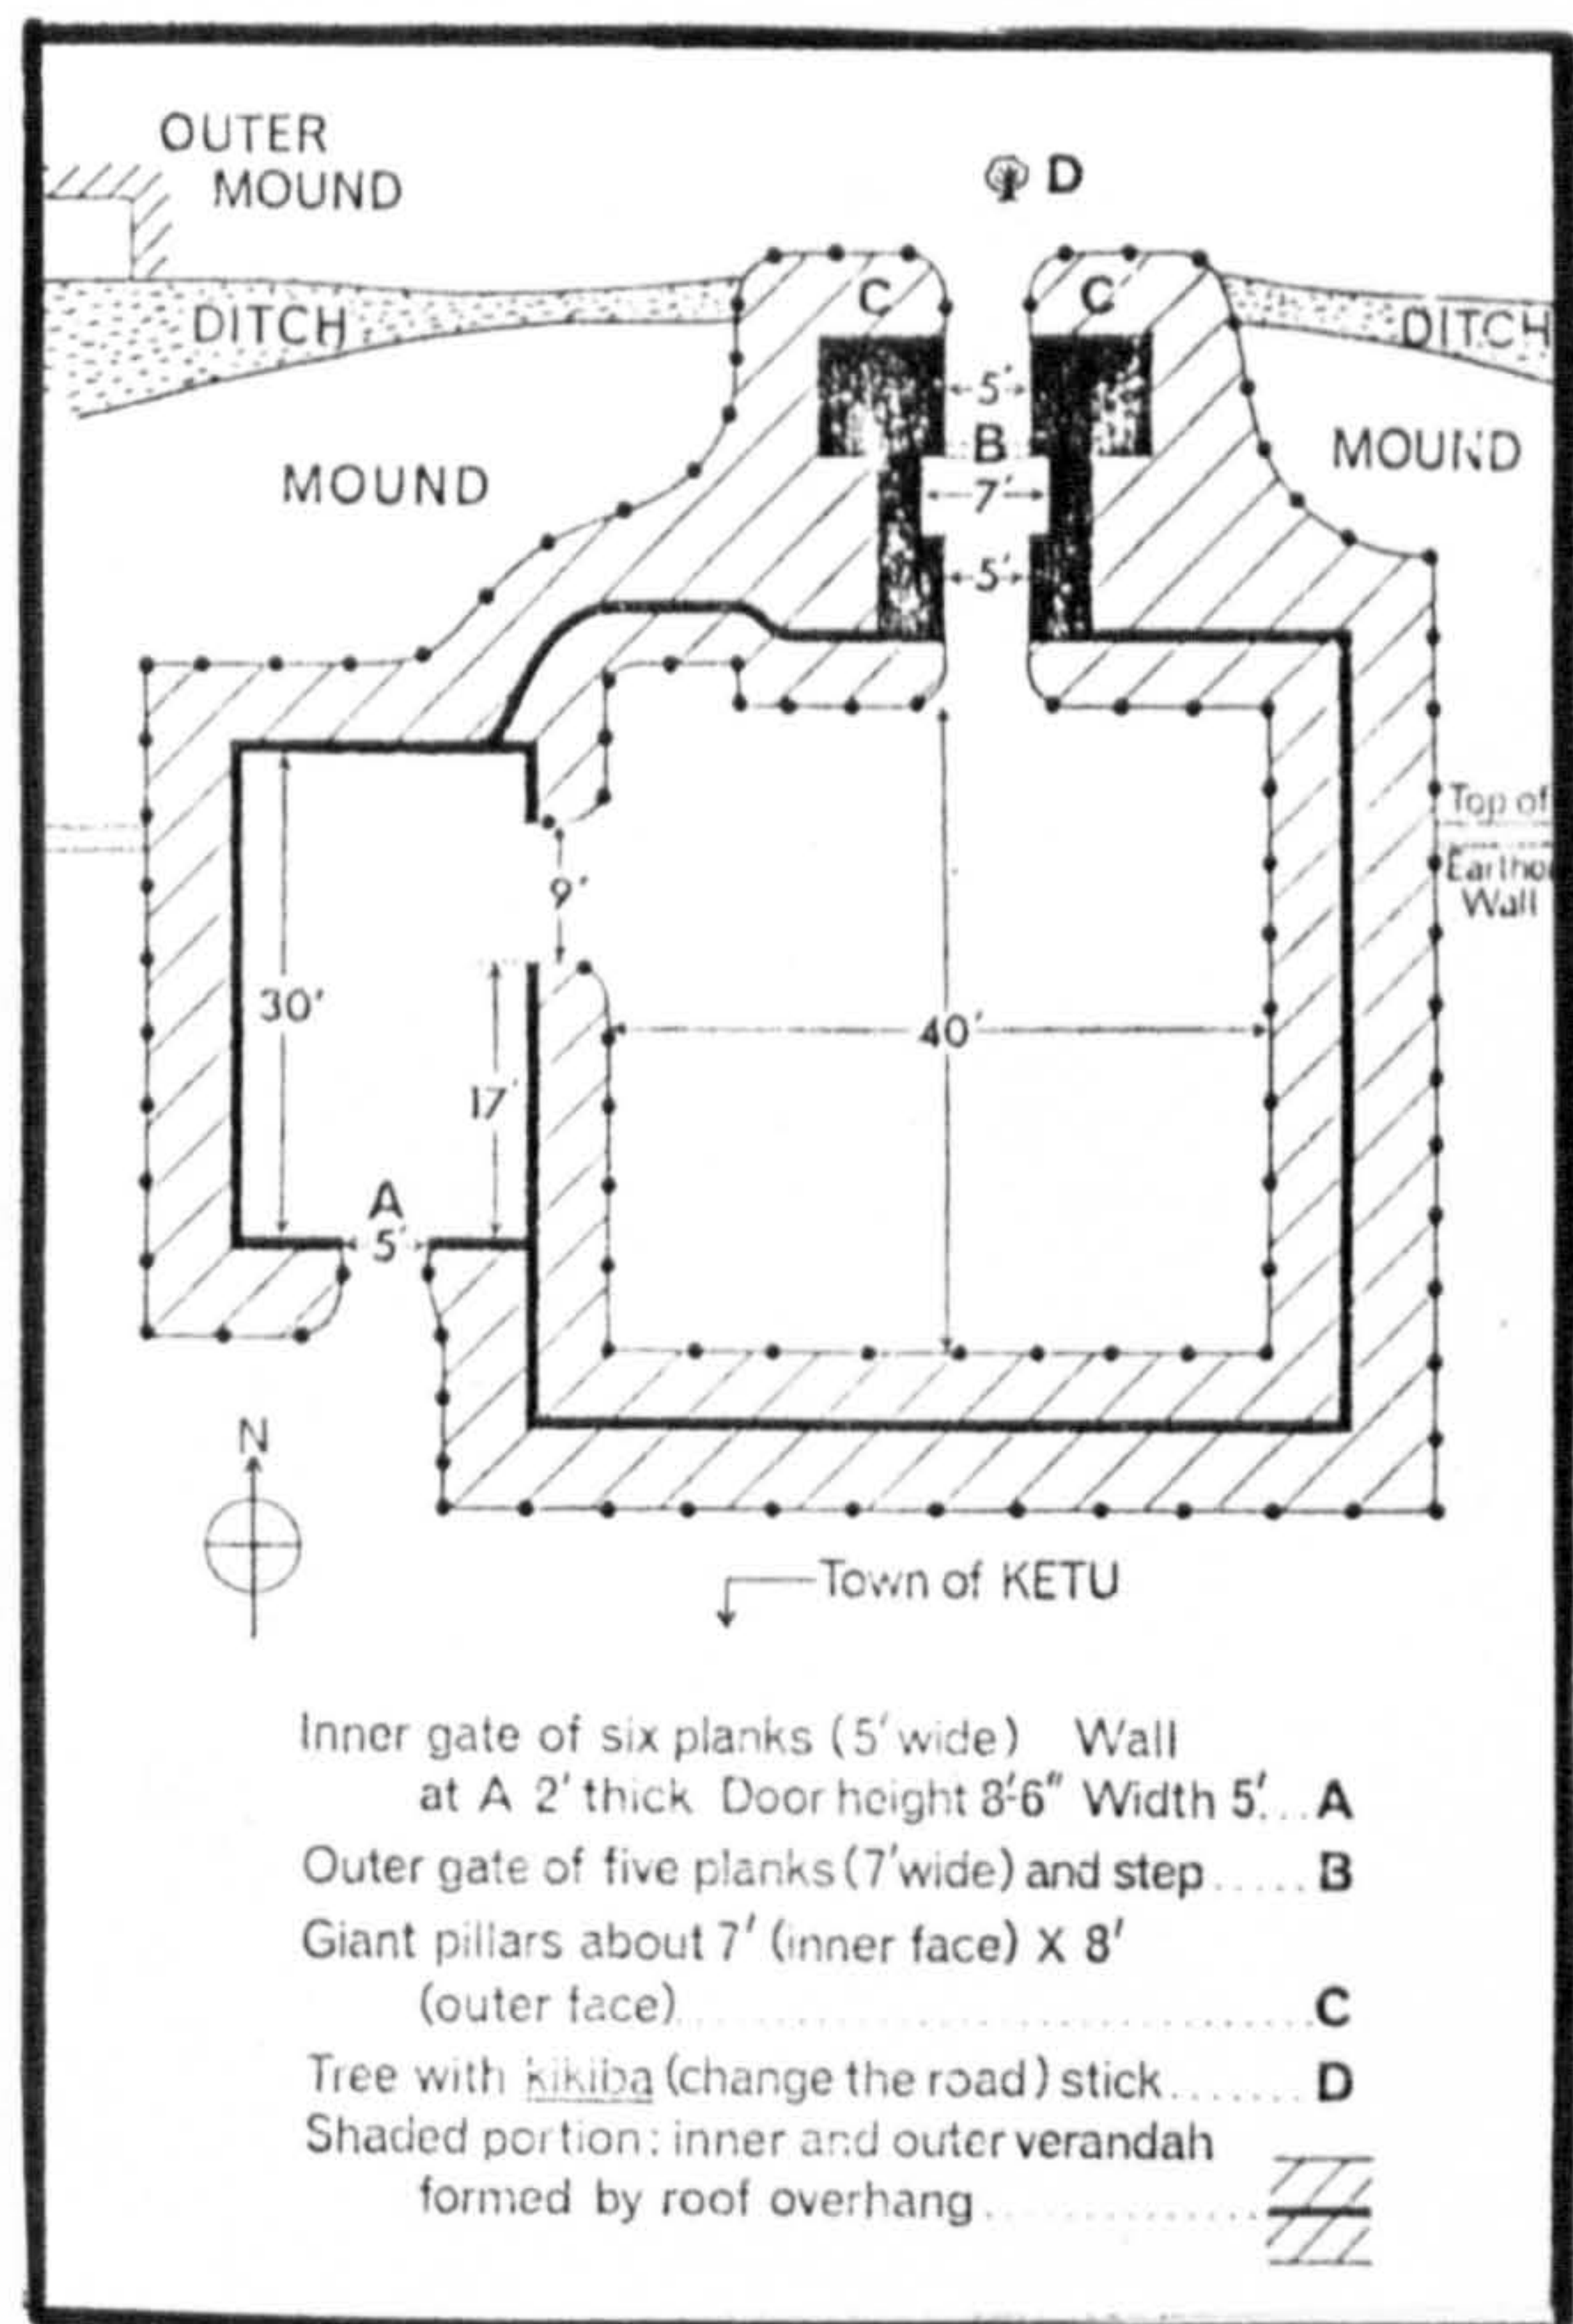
Ground Plan Of Idina Gate, Ketu, Benin.
